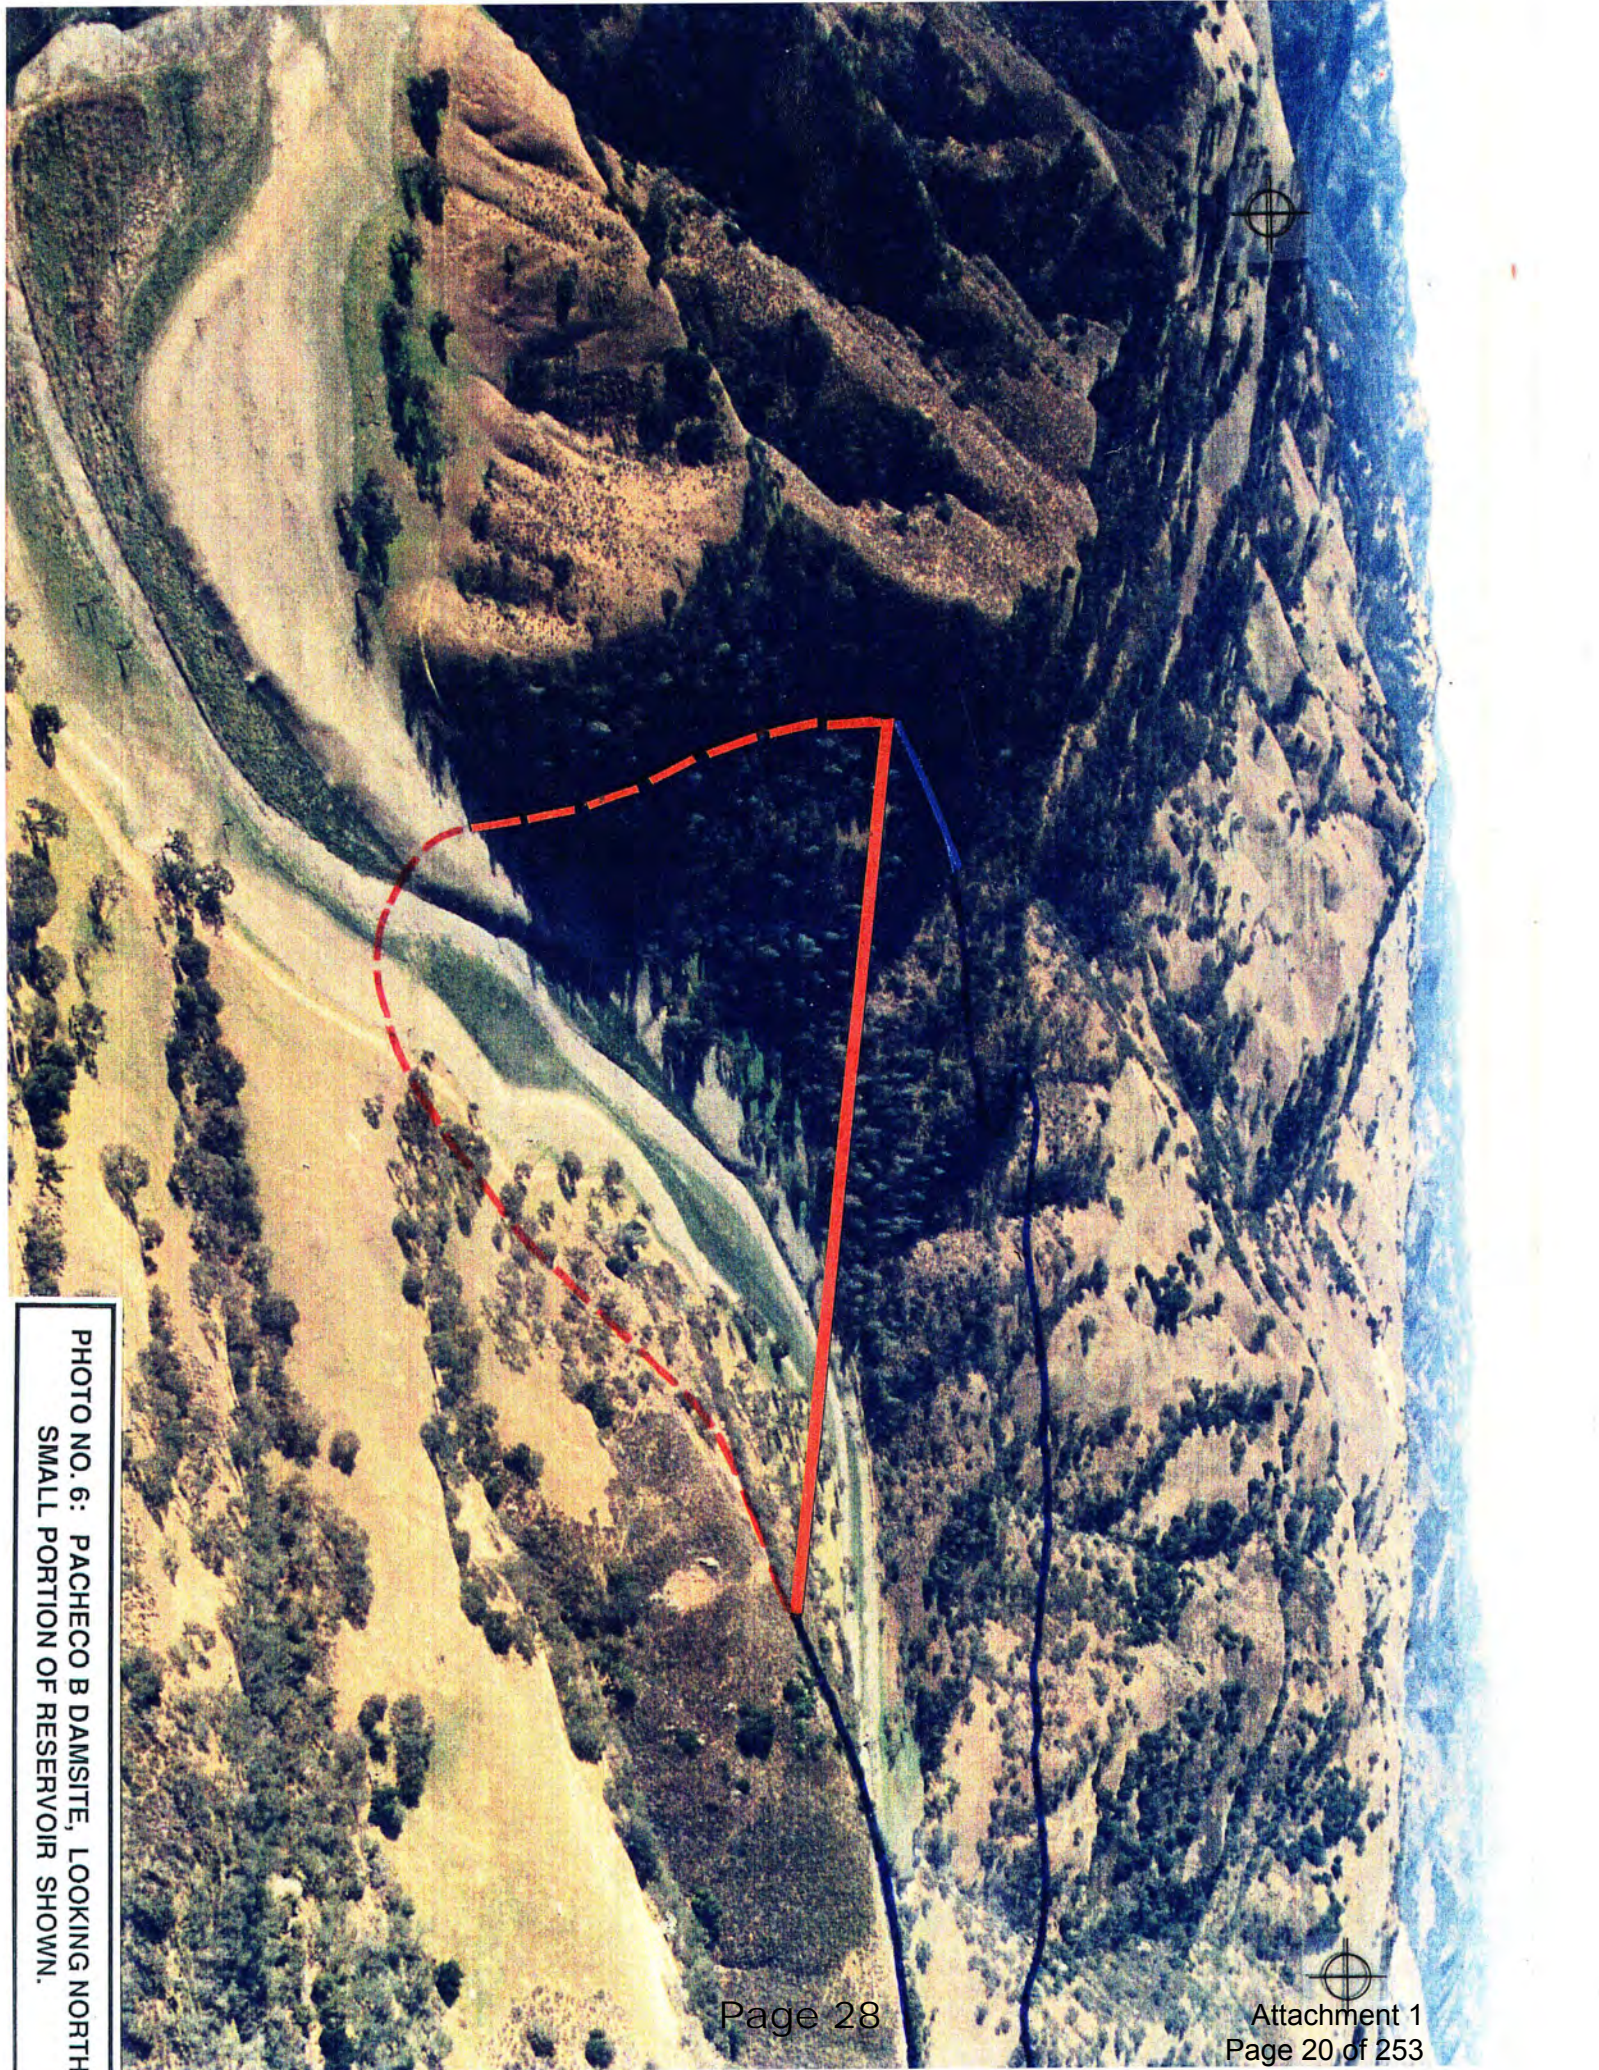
PACHECO B DAMSITE, LOOKING NORTH
